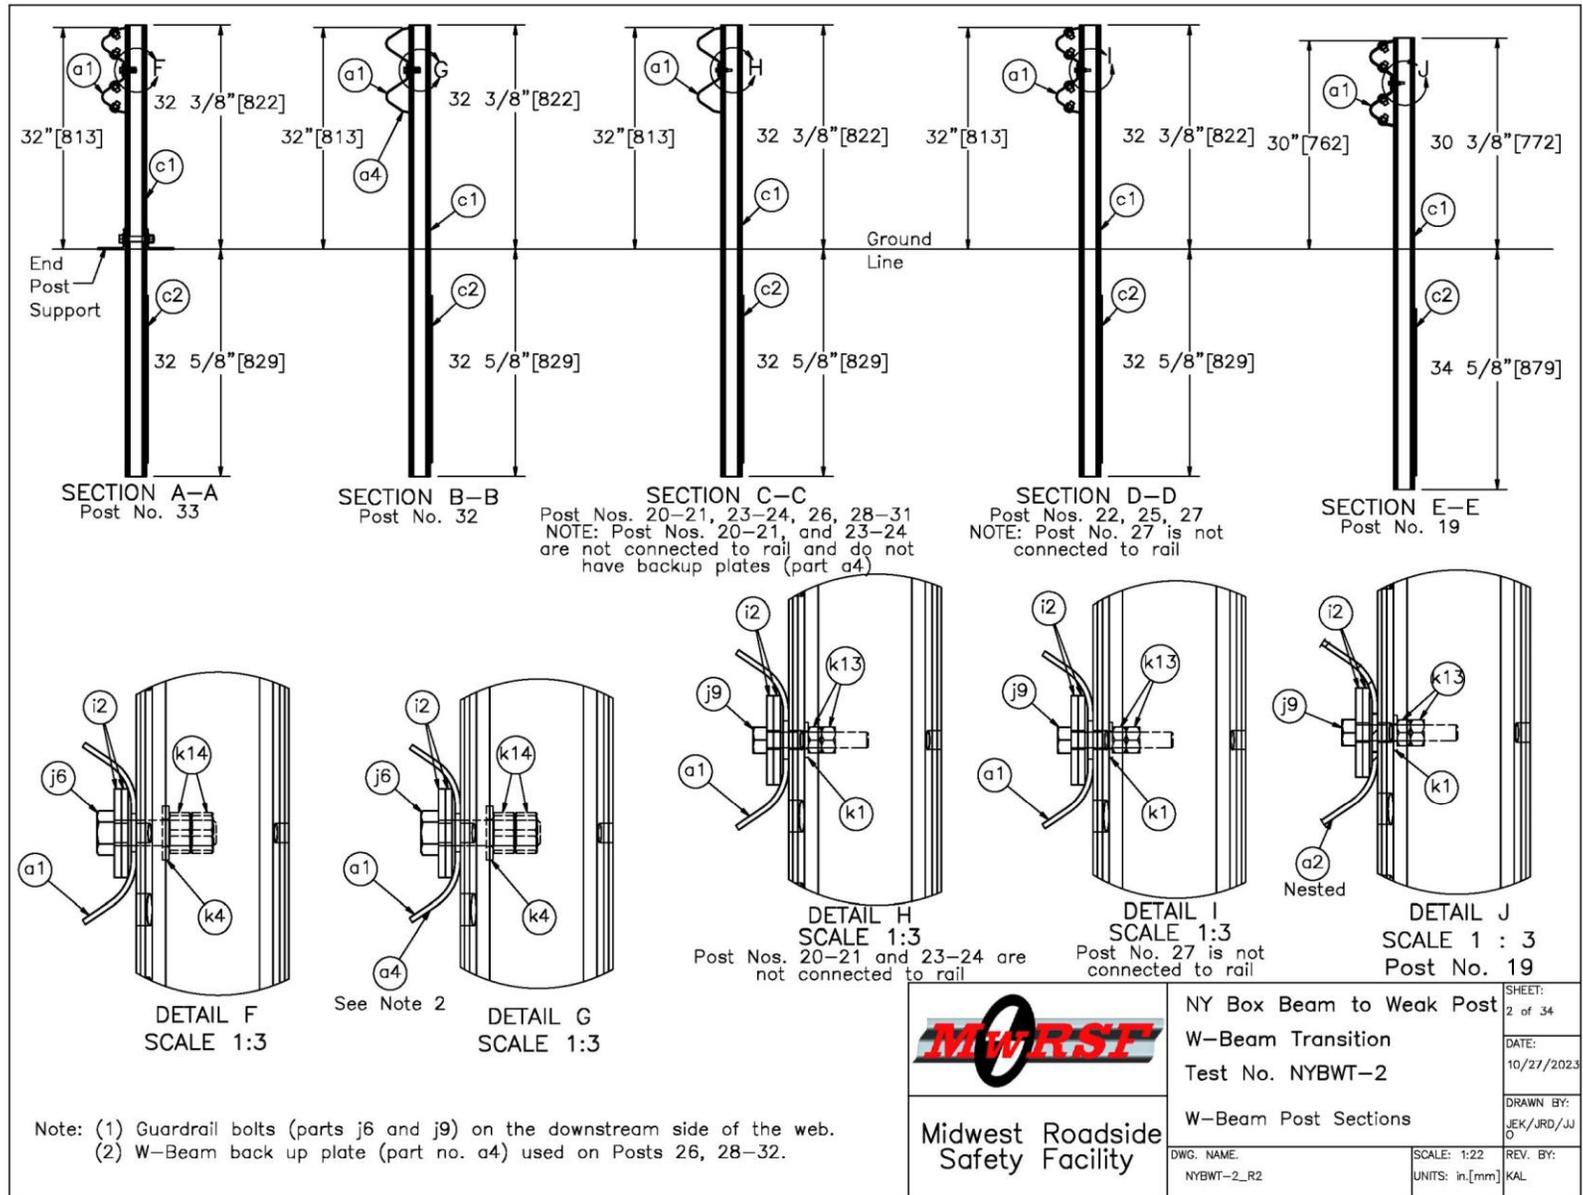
W-Beam Post Section, Test No. NYBWT-2
